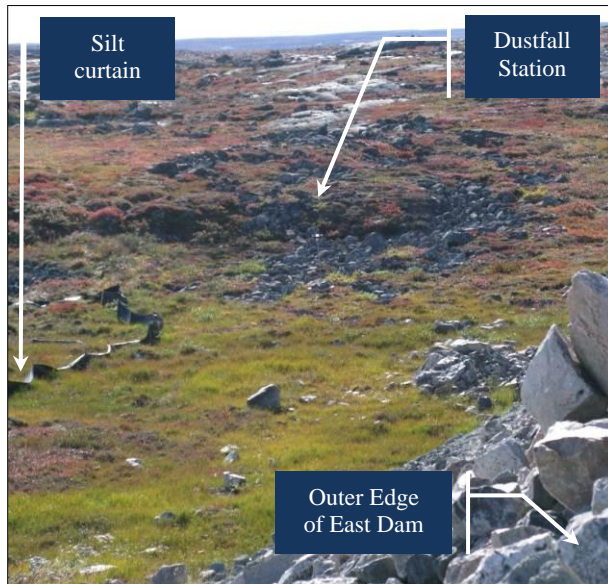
Dustfall monitoring station closest to East Dam opposite PKCA
